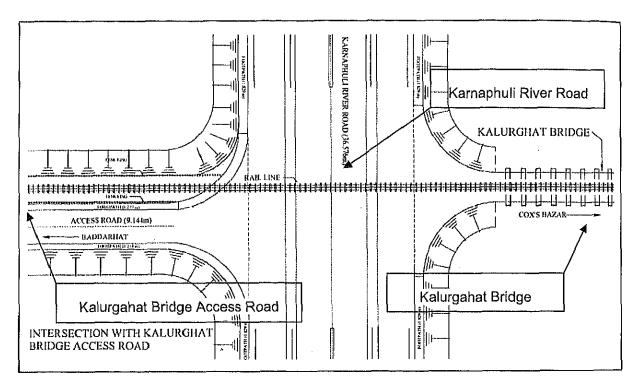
Intersection between Karnaphuli River Road and Kalurgahat Bridge Access Road
